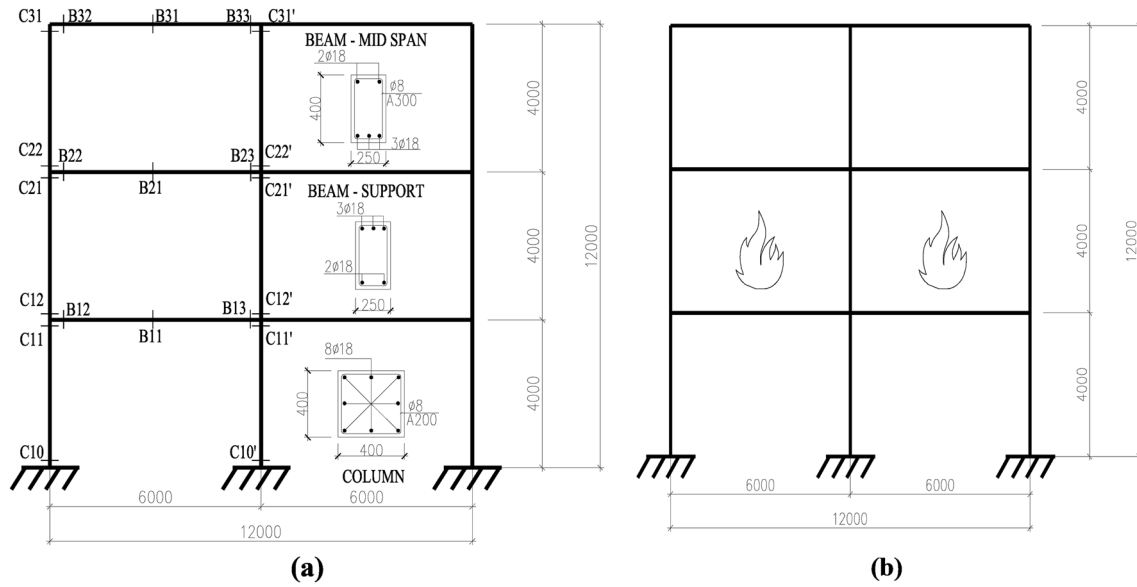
Beam and column cross section (a) and fire scenario (b)
